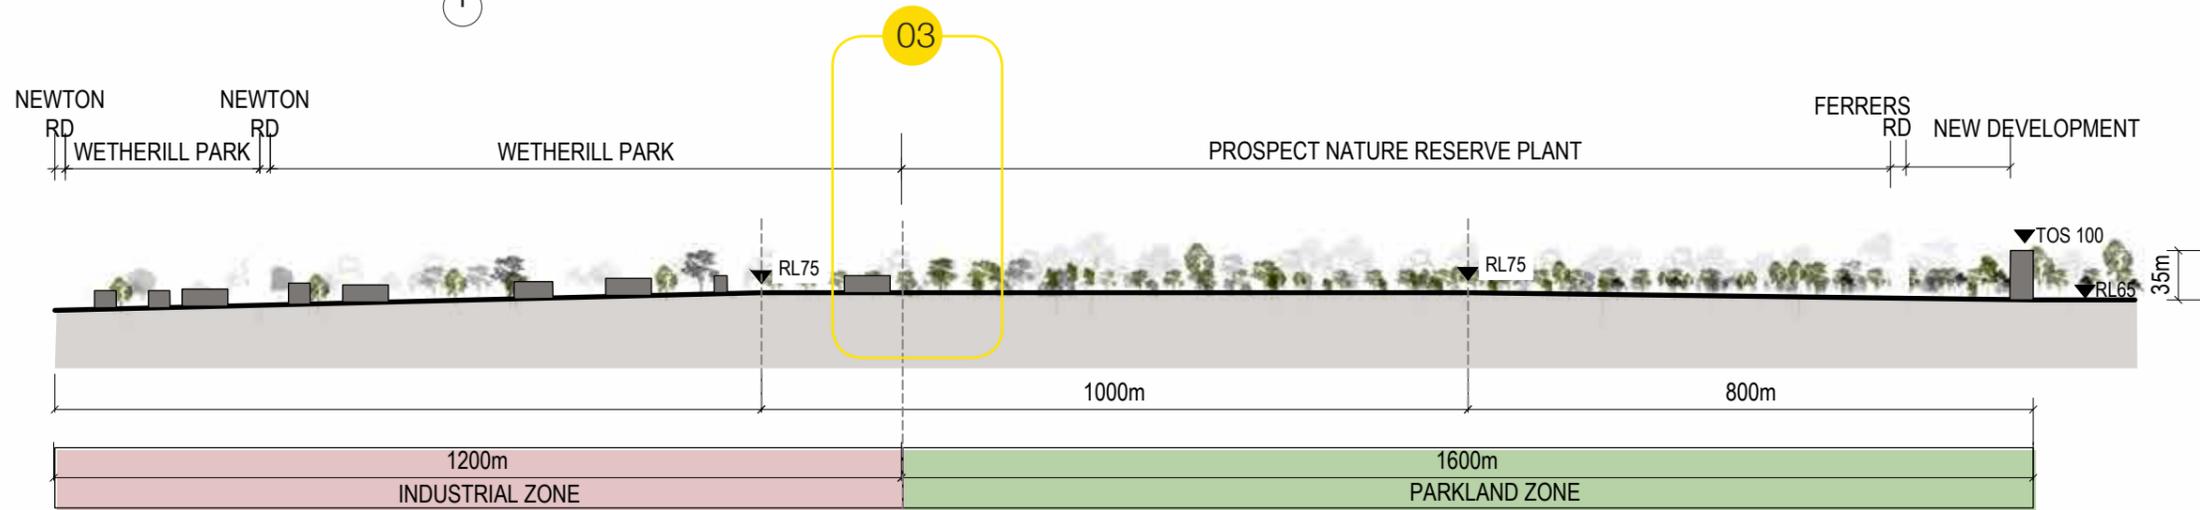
Section 03 - Wetherill Park Industrial Zone to the site
